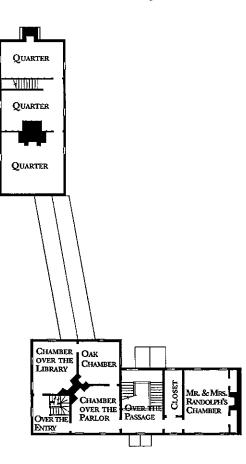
Second-floor plan of house, covered way, and kitchen-laundry-quarter as it will appear when reconstruction of the rear wing is completed. Drawing by Mark R. Wenger, 1999.
